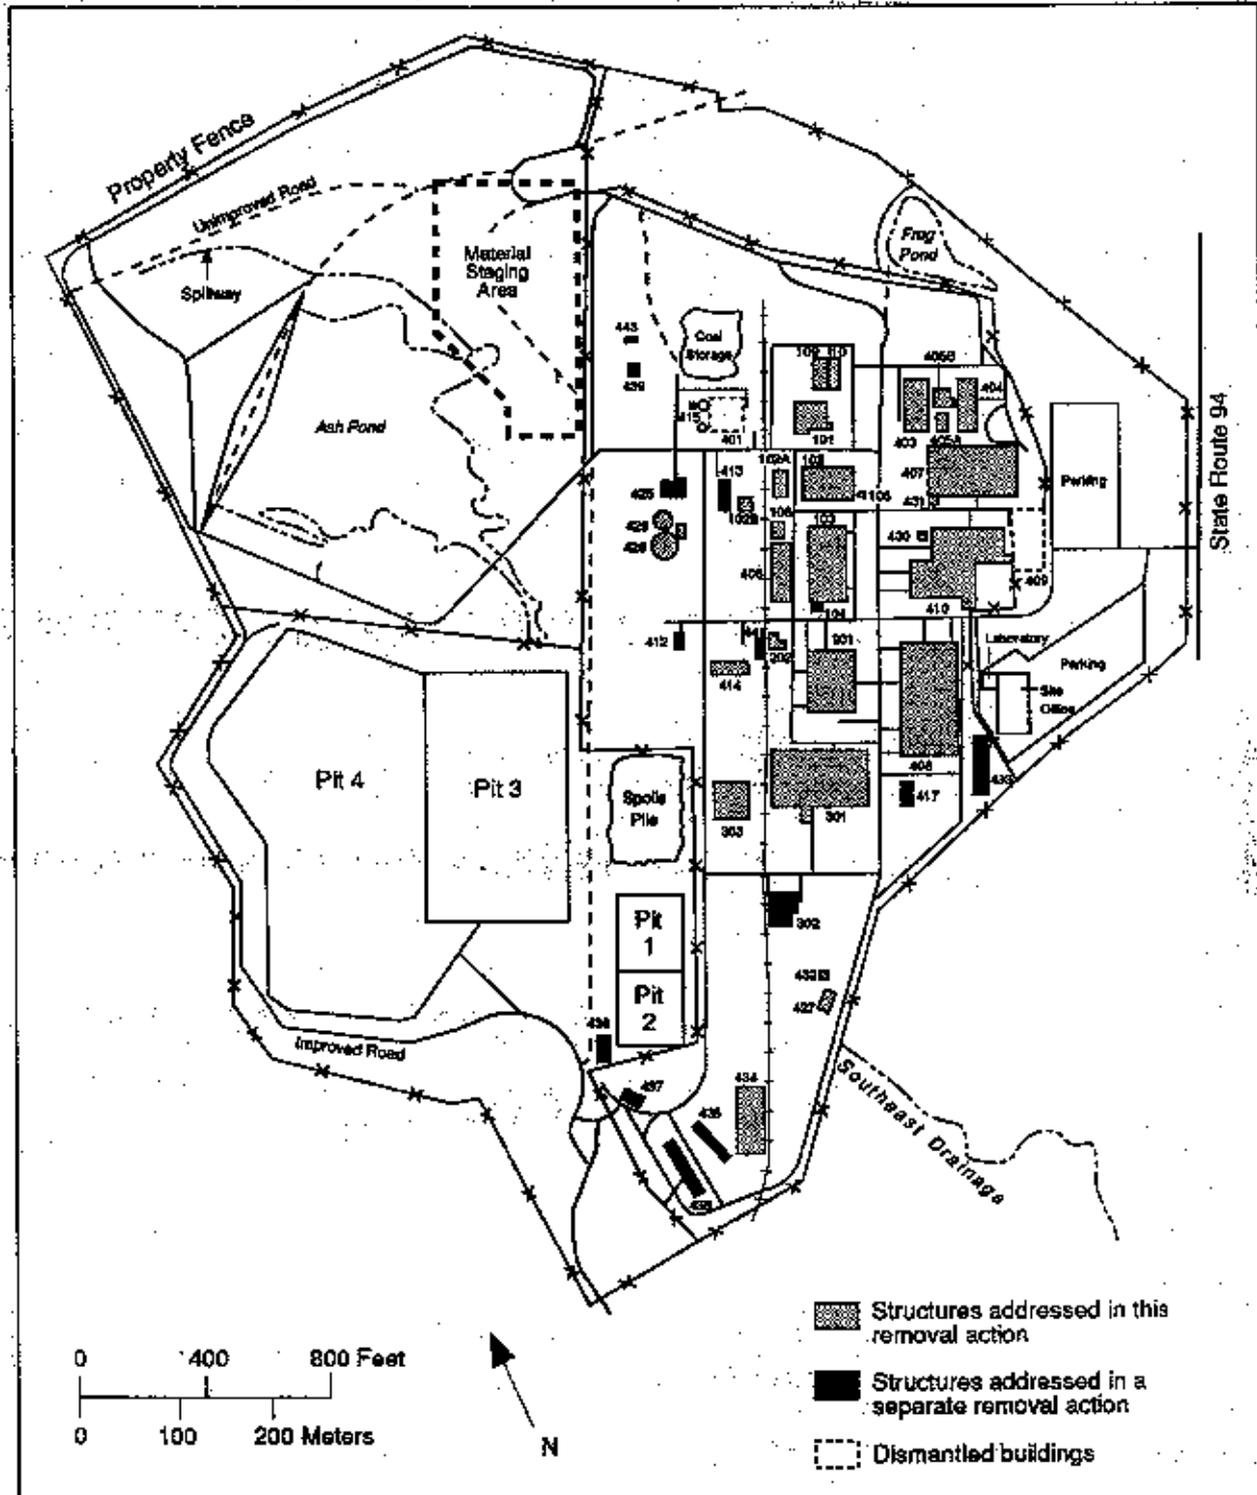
Site Layout Showing the Locations of Contaminated Structures
